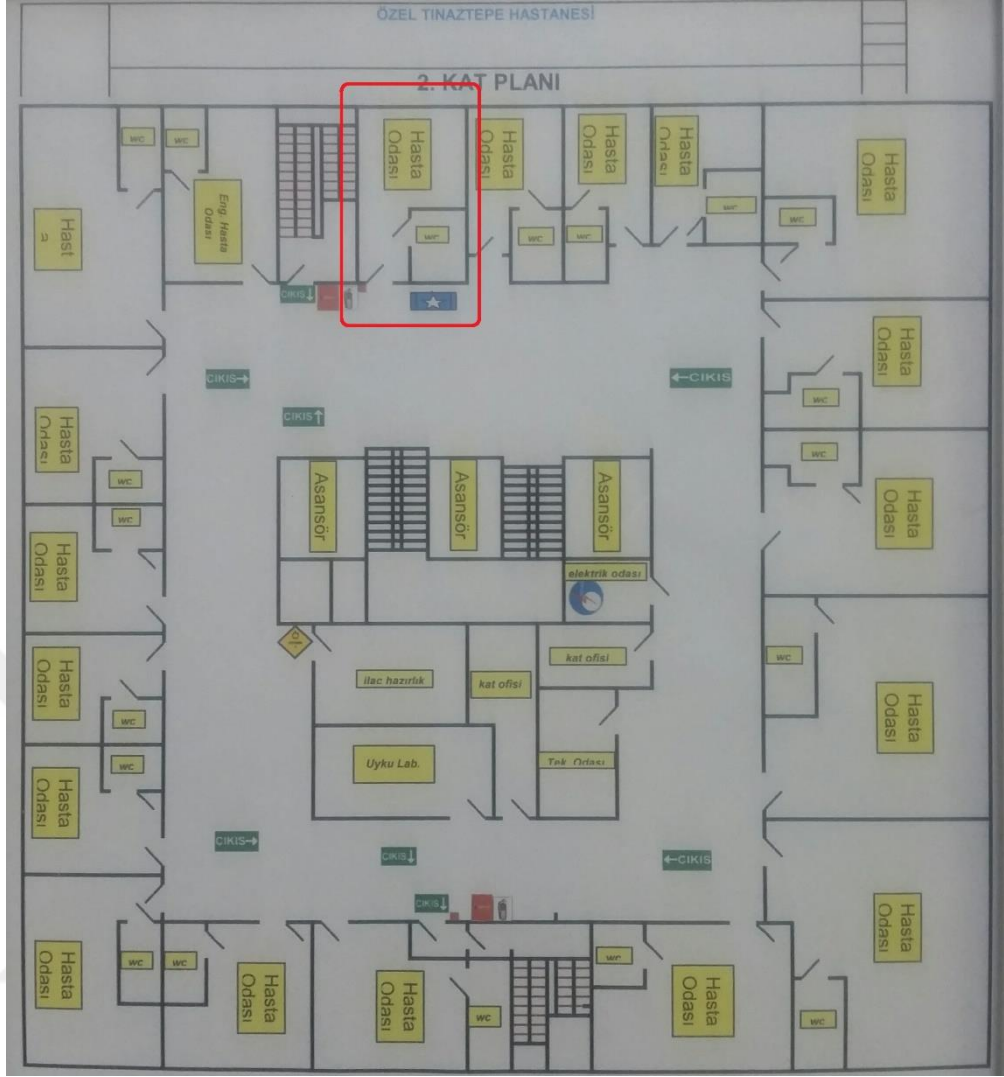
Private Tınaztepe Hospital-Floor Plan
